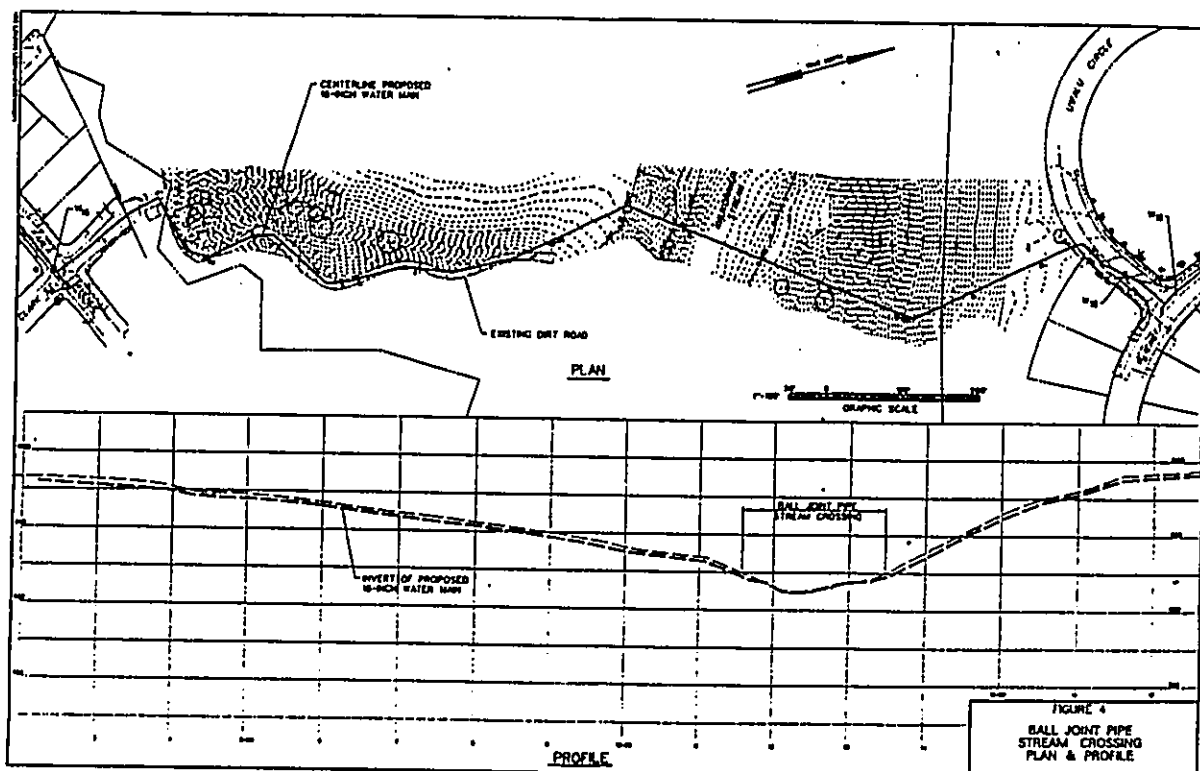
Plan and profile of Wahiawa Reservoir-Kaukonahau Stream portion of proposed water line route
